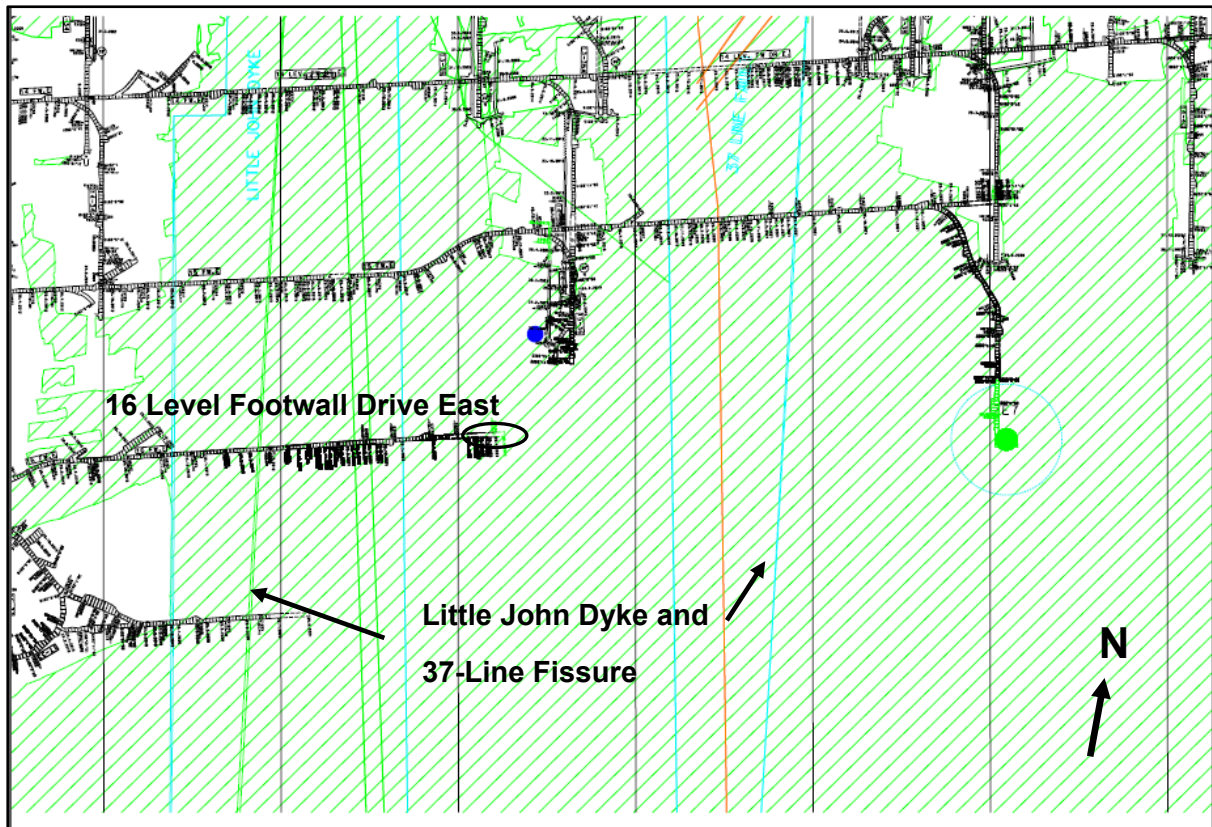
Plan depicting 16 Footwall Drive East approaching 37-line fissure and Little John Dyke associated with poor ground conditions.
